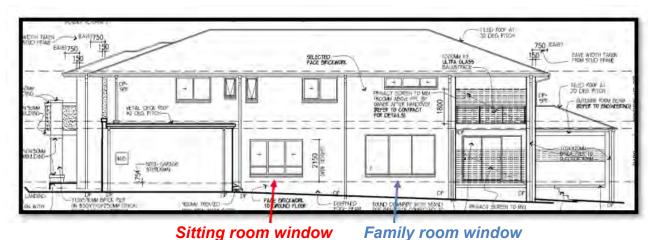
Proposed South-West elevation showing sitting room window (red) and family room window (blue).
